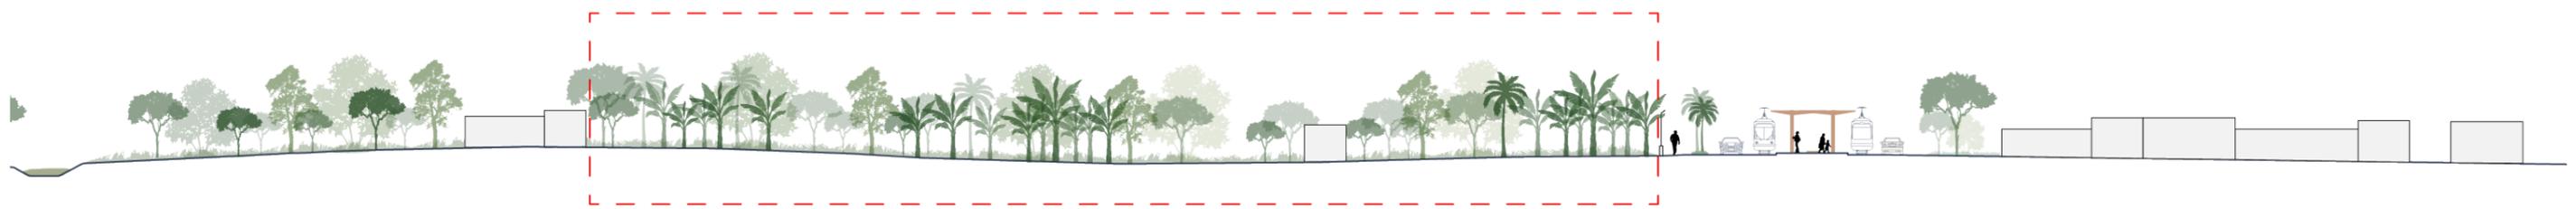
Site Plan with the proposed station | Source: Author's elaboration
